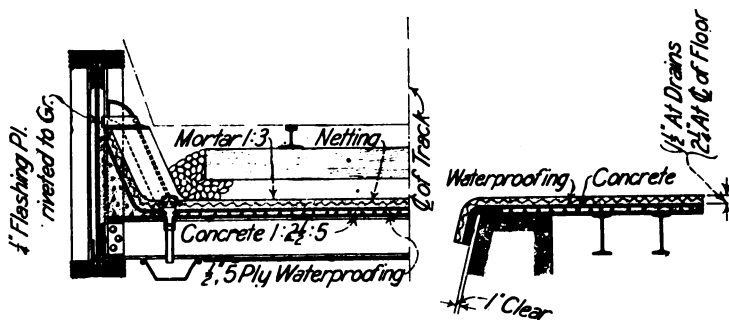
A FLASHING PLATE RIVETTED TO THE WEB IS BENT DOWN OVER THE UPPER EDGE OF WATERPROOFING MEMBRANE.
